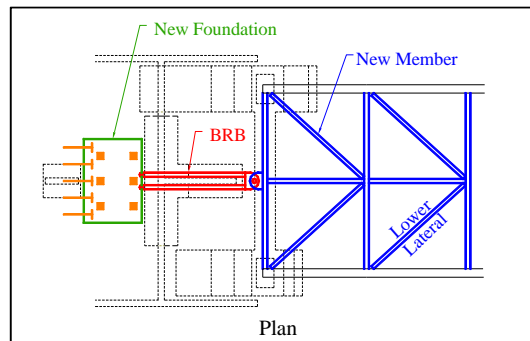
BRB LAYOUT AT PIER 1 AND 4.
